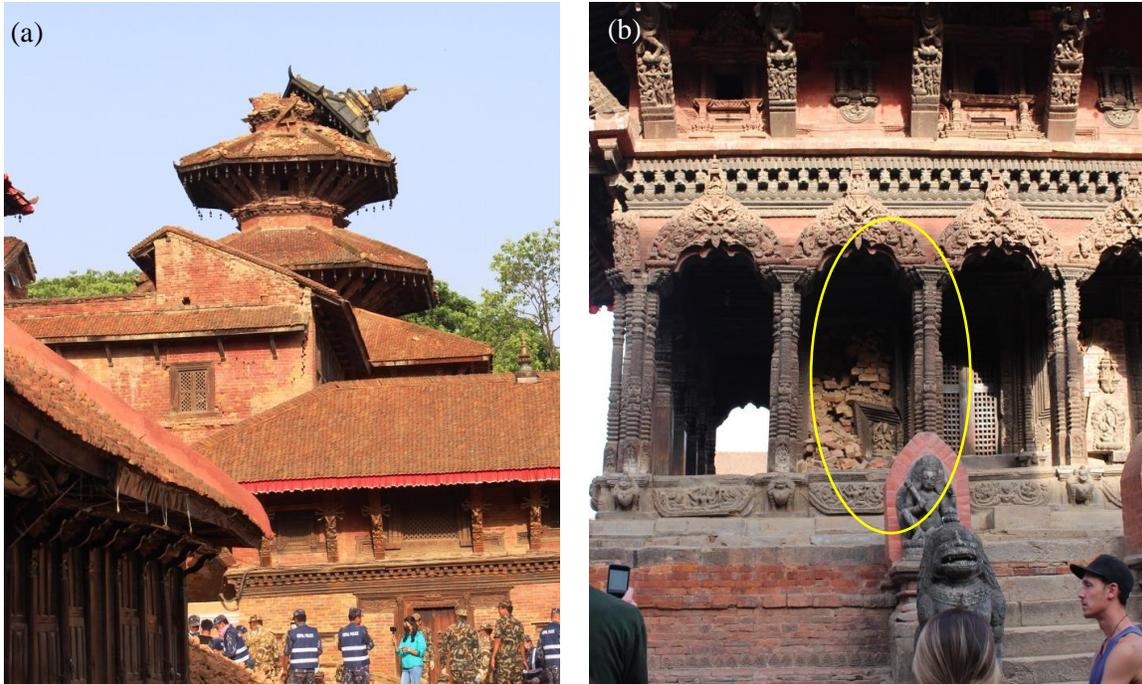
(a) Partial collapse of Taleju temple (b) Damages to masonry walls and leaning structure of Bhimsen temple at Patan.
